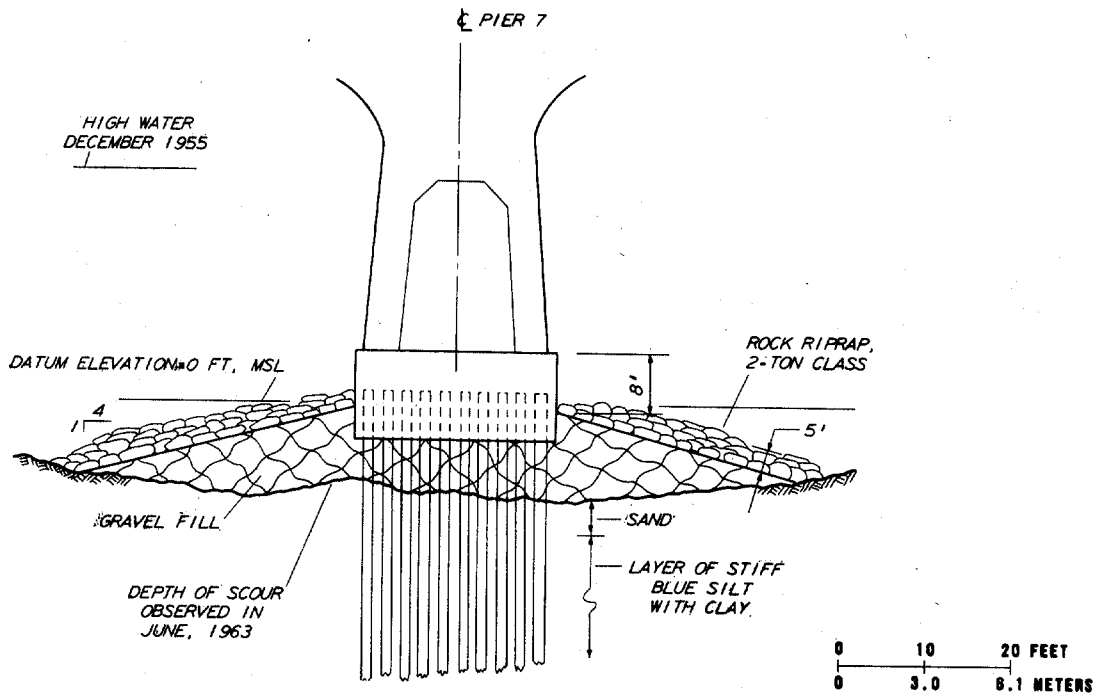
Protection of pier 7 in 1963 to prevent additional scour.
